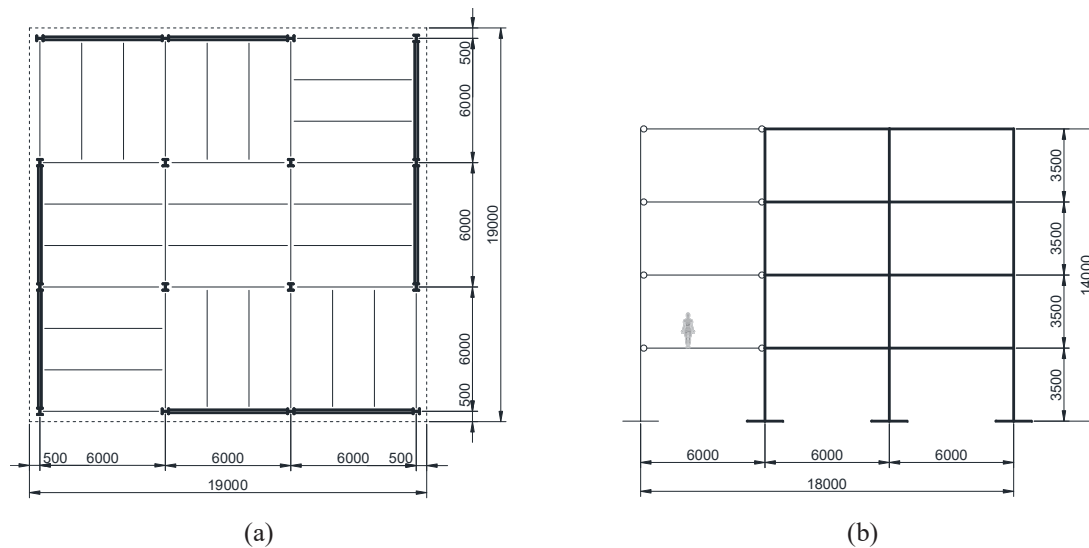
Arrangement and dimensions (mm) of the structural configuration: (a) floor layout (with columns, main beams and secondary beams); (b) perimeter moment resisting frame
